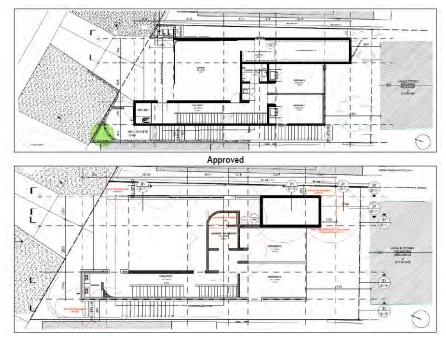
Comparison Plans between the Approved and Proposed Development at Garage Floor Level (Source: GSA Statement of Environmental Effects)
